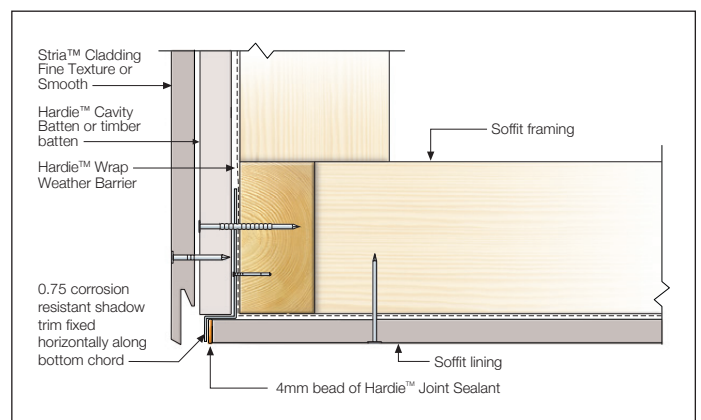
FACADE/SOFFIT JUNCTION - CAVITY FIX
